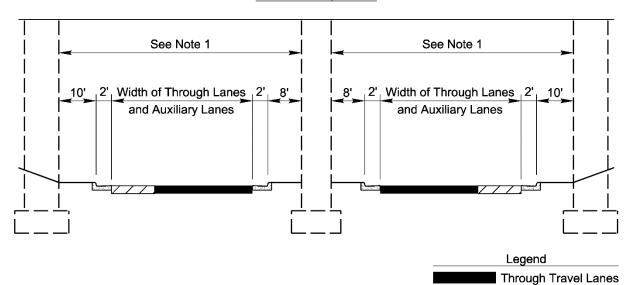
Arterial System Horizontal Clearances for Divided Traffic Curb and Gutter Approach
